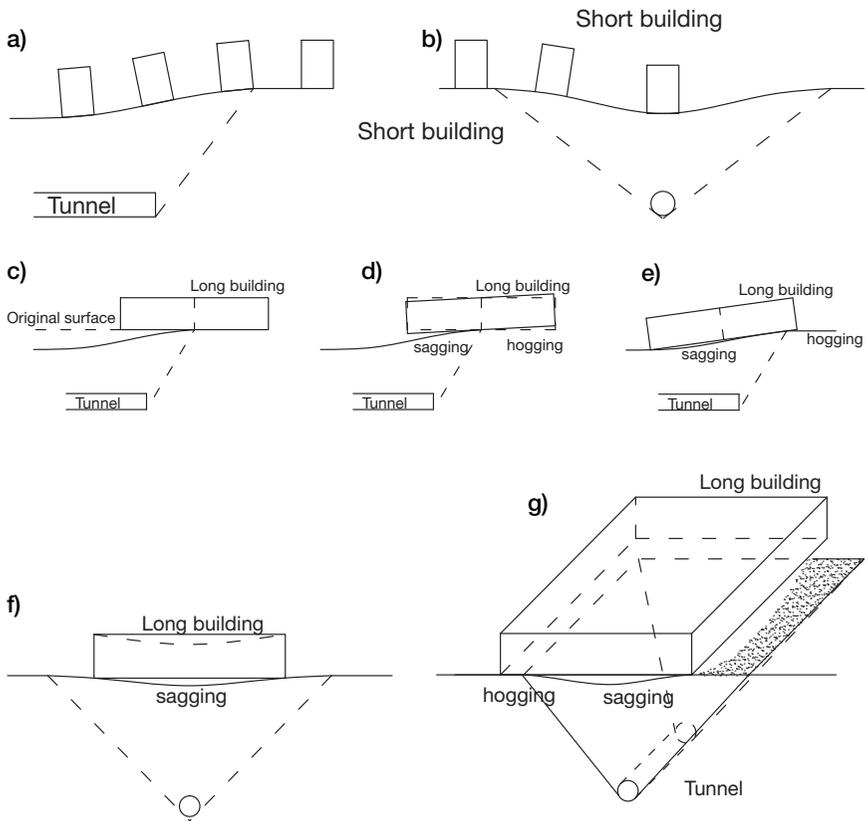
Some idealized modes of behaviour for short buildings and long buildings due to a tunnel construction below (Attewell 1995, after Attewell *et al.* 1986)
